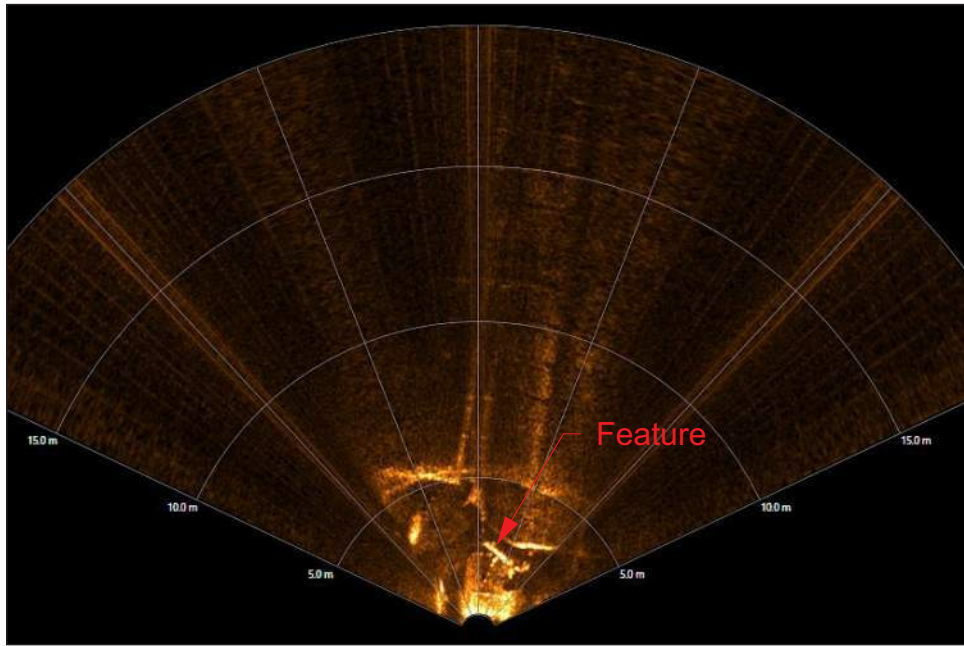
Sonar image at 154 feet downstream of Access Point 1. Feature in manhole chamber 8 feet ahead.
